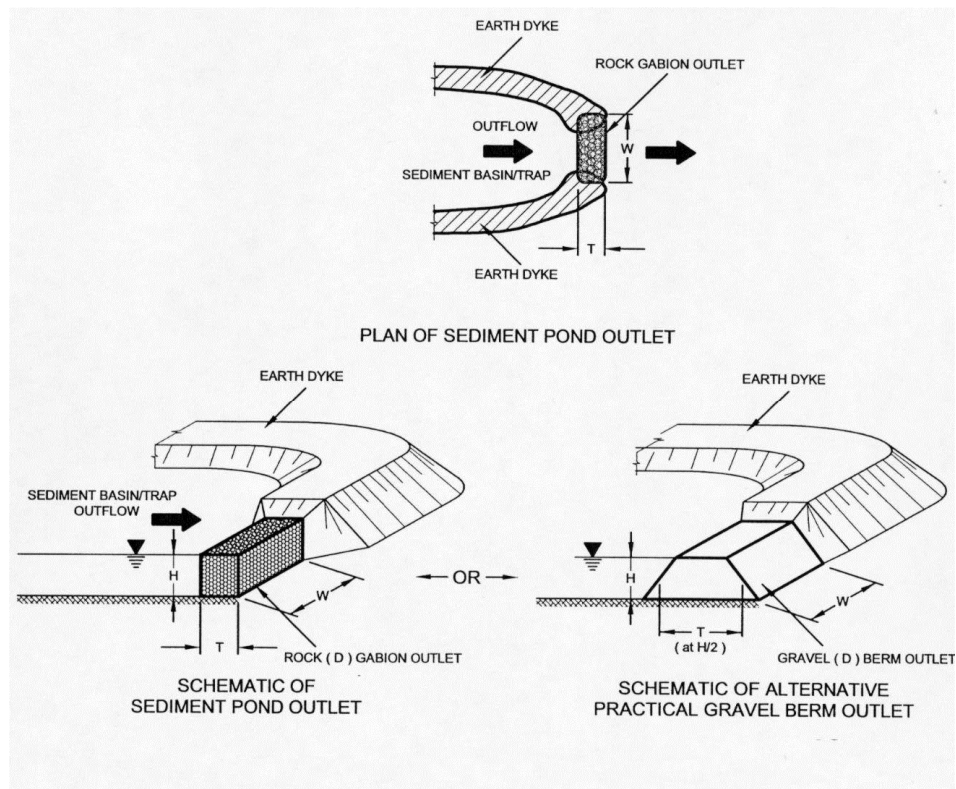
Model of Drainage Outlet of Sediment Pond
